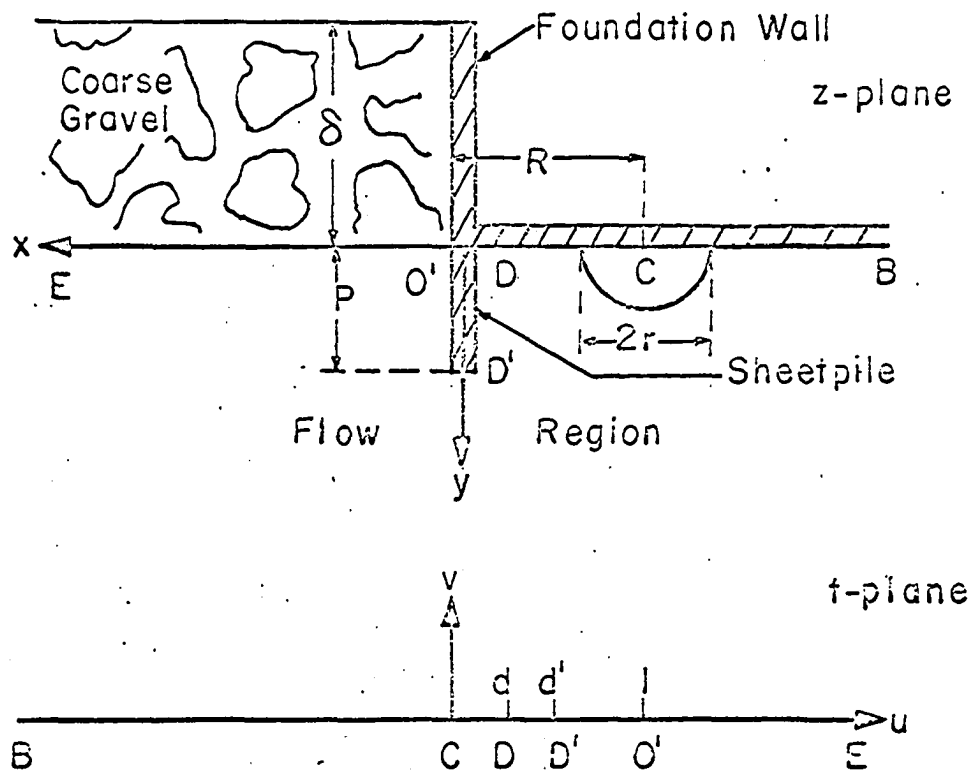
The z and t -planes used for a sheetpile extending vertically downward from the corner of an infinitely wide foundation.
